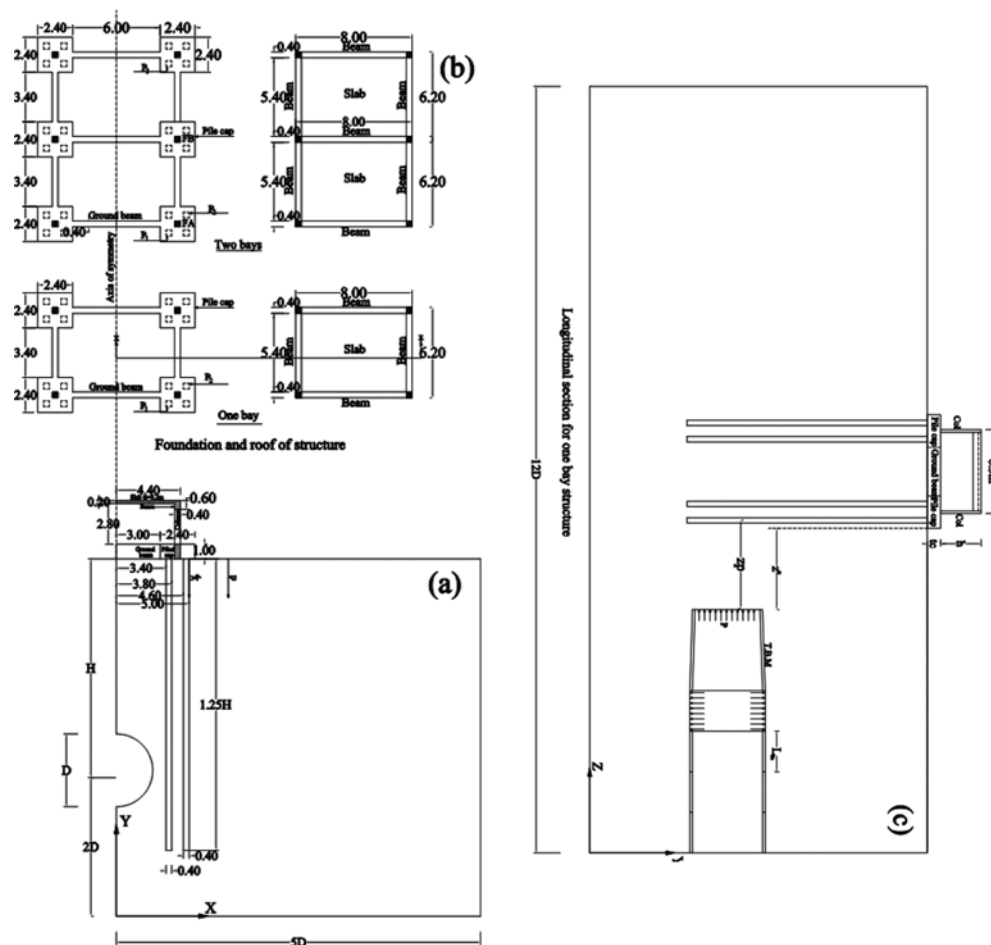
Model Geometry: (a) Transverse Section Elevation, (b) Plan, (c) Longitudinal Section Elevation
